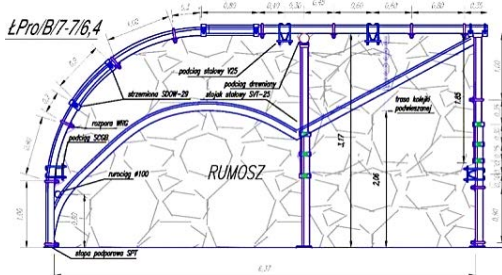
ŁPrP supports structure with elbow corners between the roof and the side wall arches
